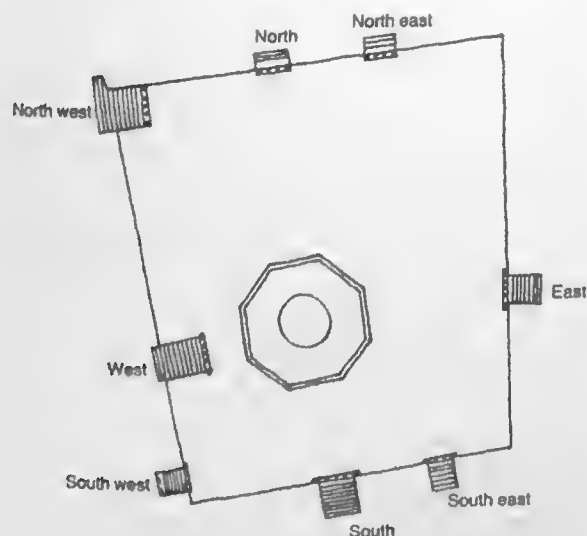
Sketch plan of the Haram colonnades (after Van Berchem).
